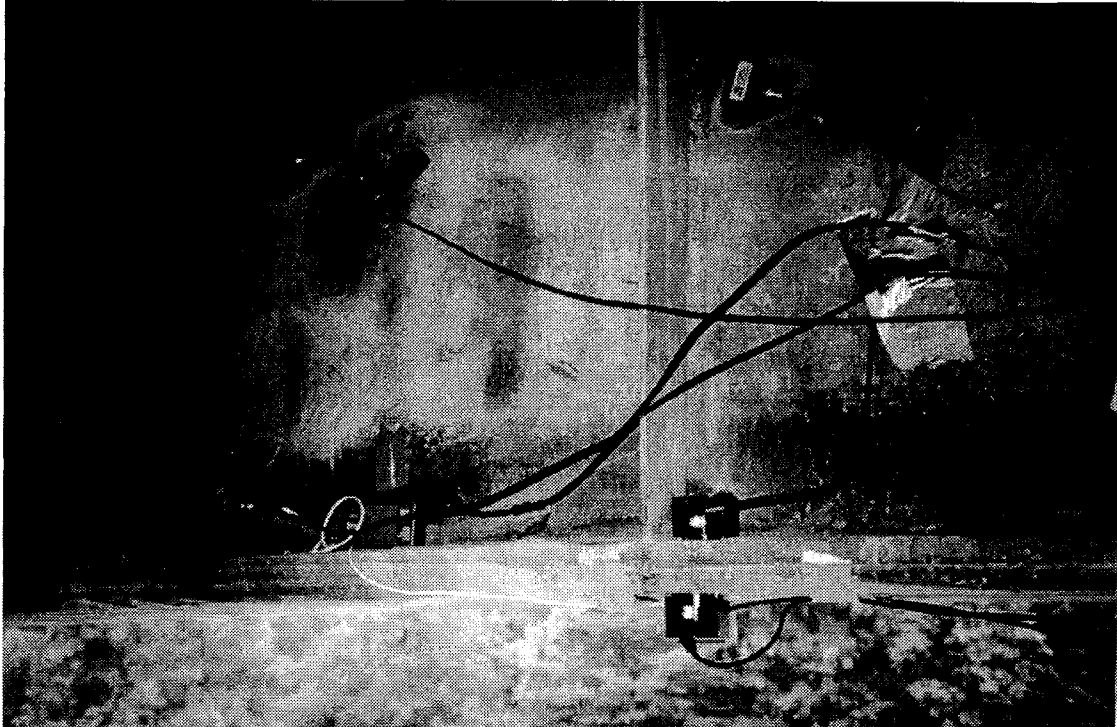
Repaired girder showing location of sensors 3 and 4 positioned for source location to monitor lower flange-to-web weld and guard sensors 5 and 6
